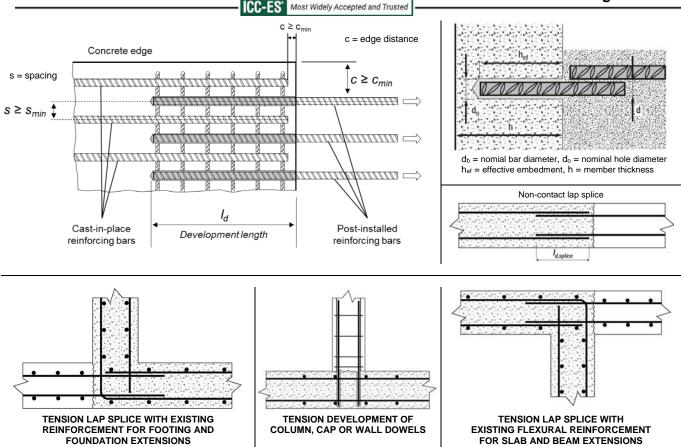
INSTALLATION DETAIL FOR POST-INSTALLED REINFORCING BAR CONNECTIONS (Top Pictures), EXAMPLES OF DEVELOPMENT LENGTH APPLICATION DETAILS FOR POST-INSTALLED REINFORCING BAR CONNECTIONS PROVIDED FOR ILLUSTRATION (Bottom Pictures)
